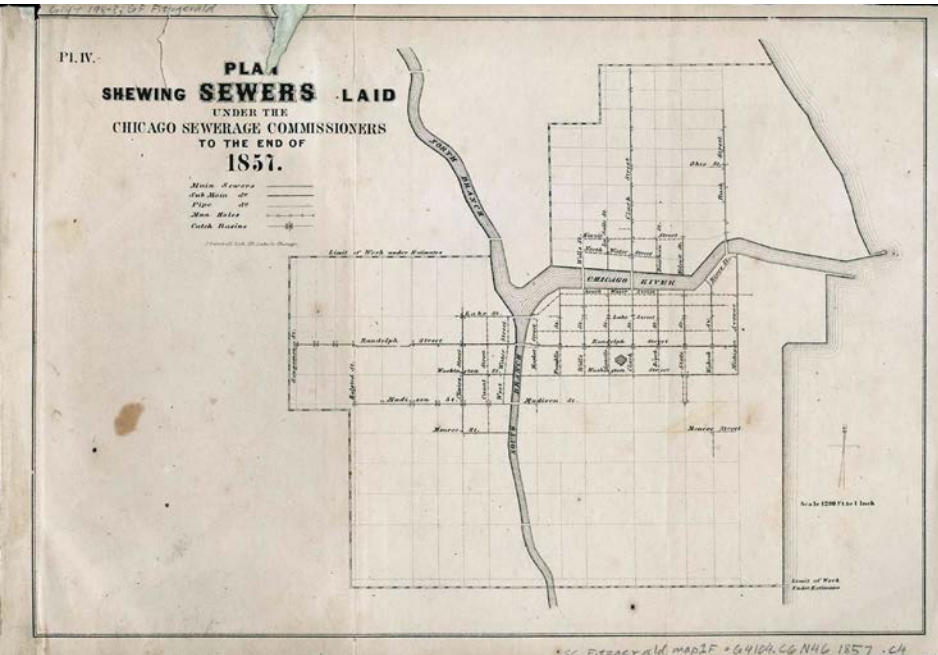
Plan showing sewers laid under the Chicago Sewerage Commissioners to the end of 1857. 1858.
